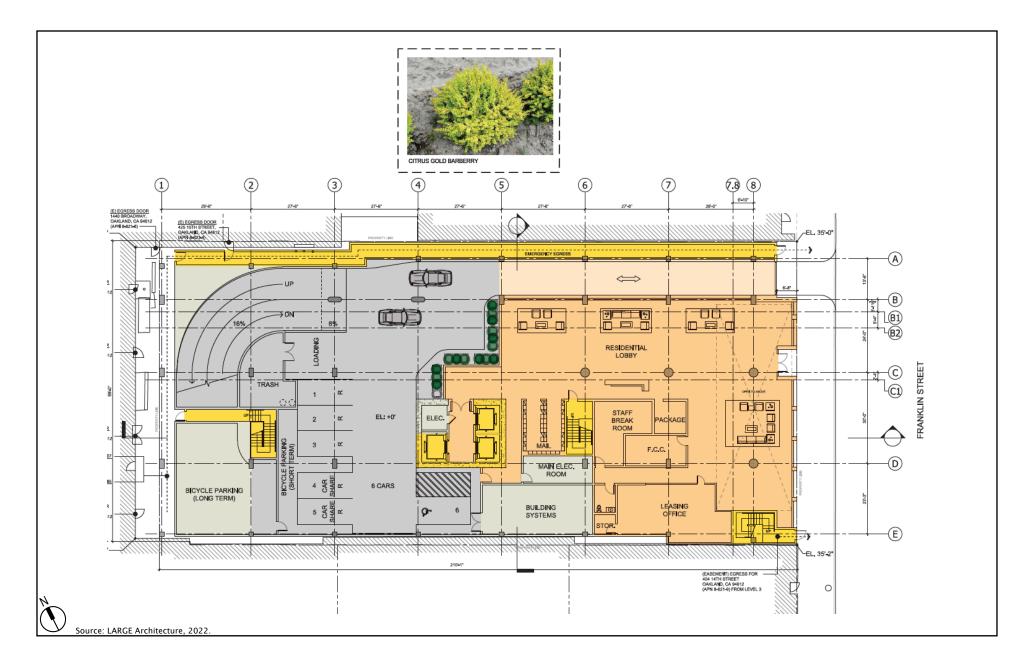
Landscape Plan - Ground Floor – 1431 Franklin Street Residential Project
